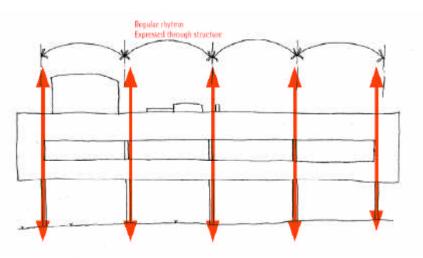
Sketch elevation showing the order introduced by exploiting the structural grid
